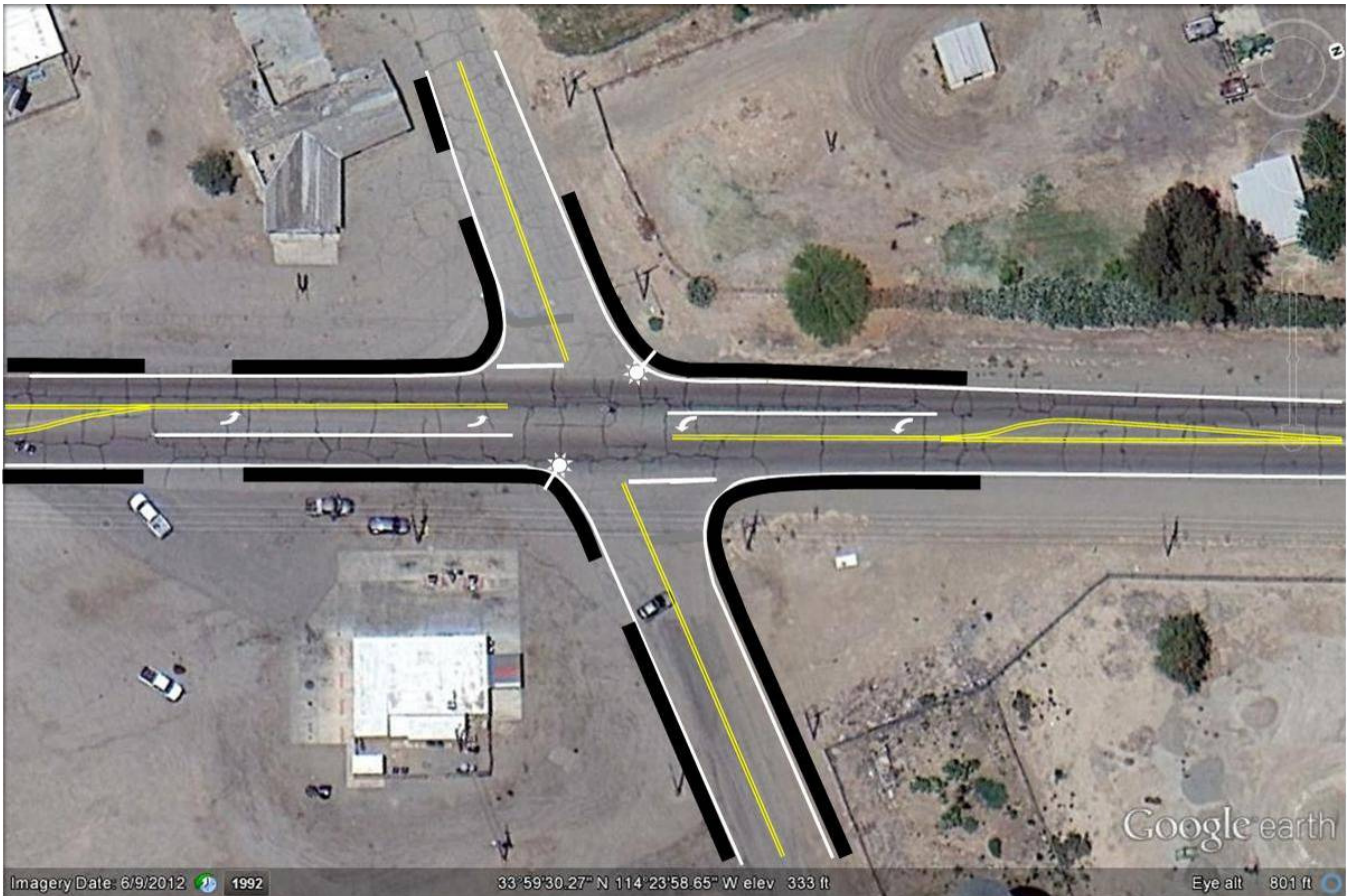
Sketch of Recommendations for the Mohave Road/Poston Road Intersection
